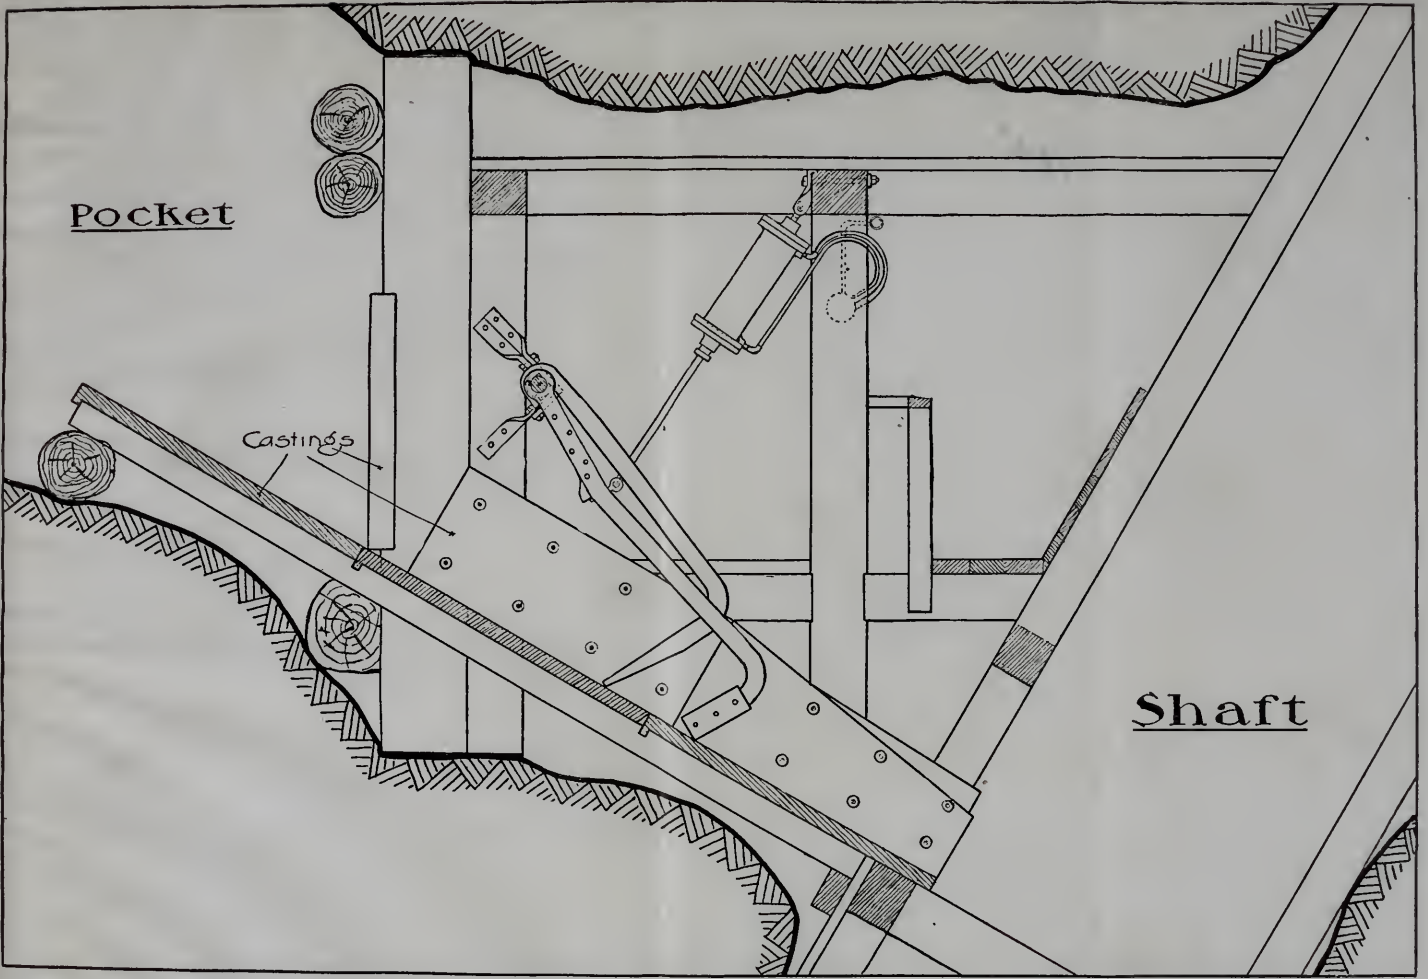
Fig. XVI.—Skip Loading Device at Victoria Shaft Pockets.
